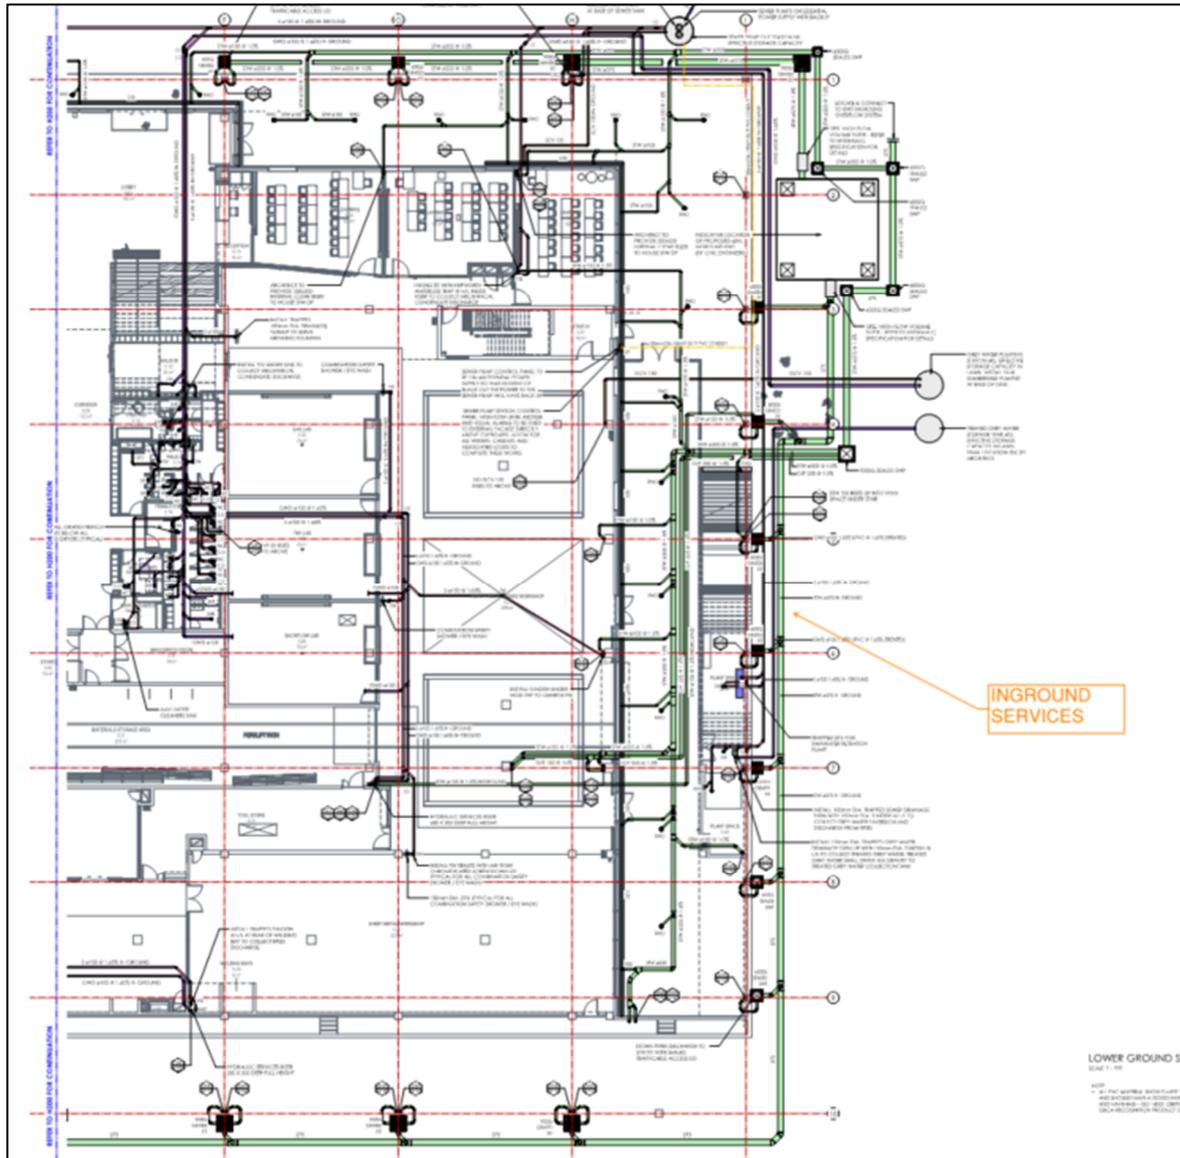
Inground Structure (Typical Example- Sanitary Drainage, Stormwater, Electrical, Mechanical etc)
